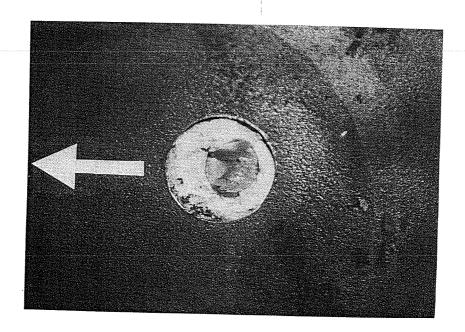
Plastic deformation of adhesive filling the annulus (anchor bolt originally in center) - closeup view
